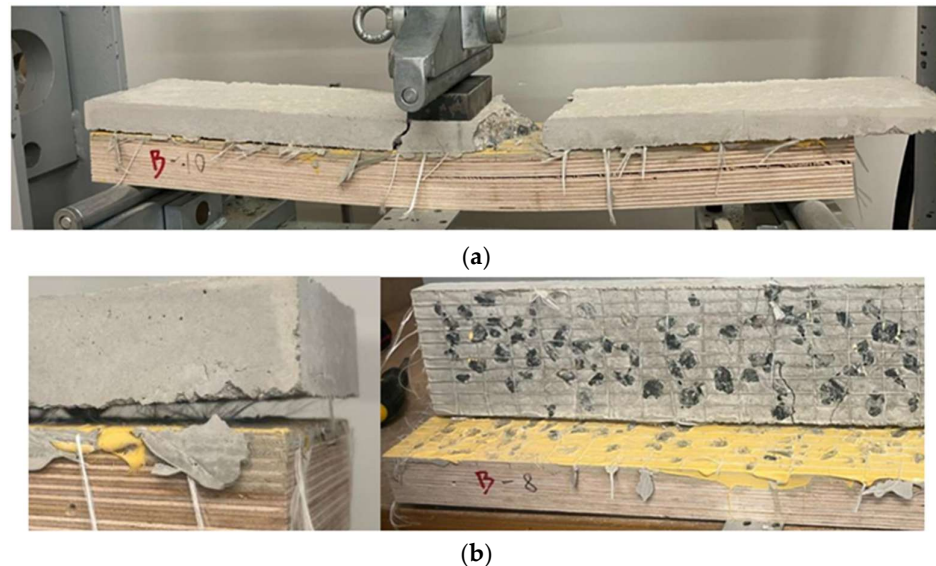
Mode of failure of the B group of specimens: (a) specimen B-10; (b) specimen B-8.
